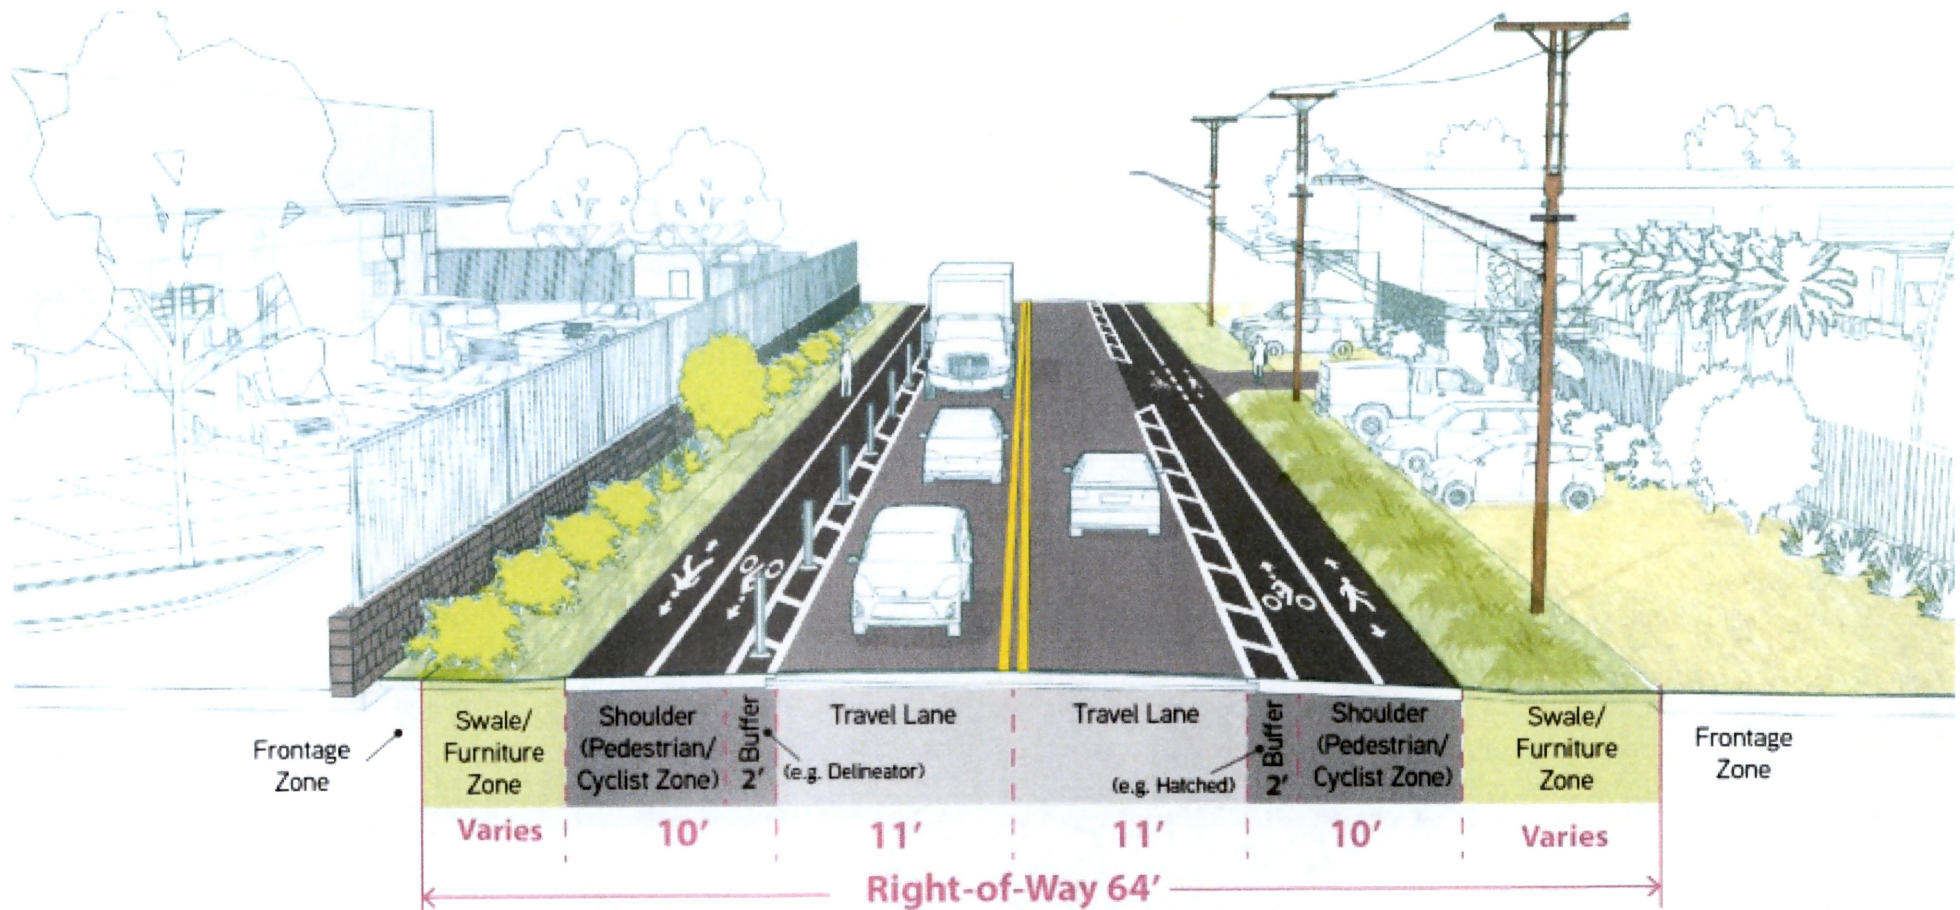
COLLECTOR STREET TYPICAL CROSS SECTION (URBAN)
